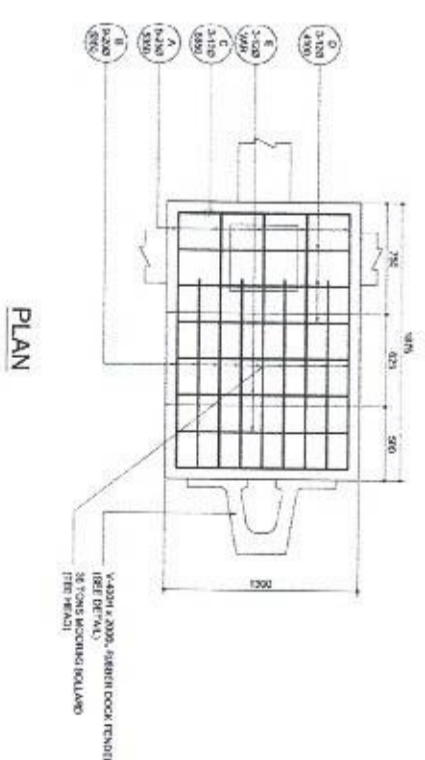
DETAIL OF PILE CAP - B FOR VERTICAL PILES
